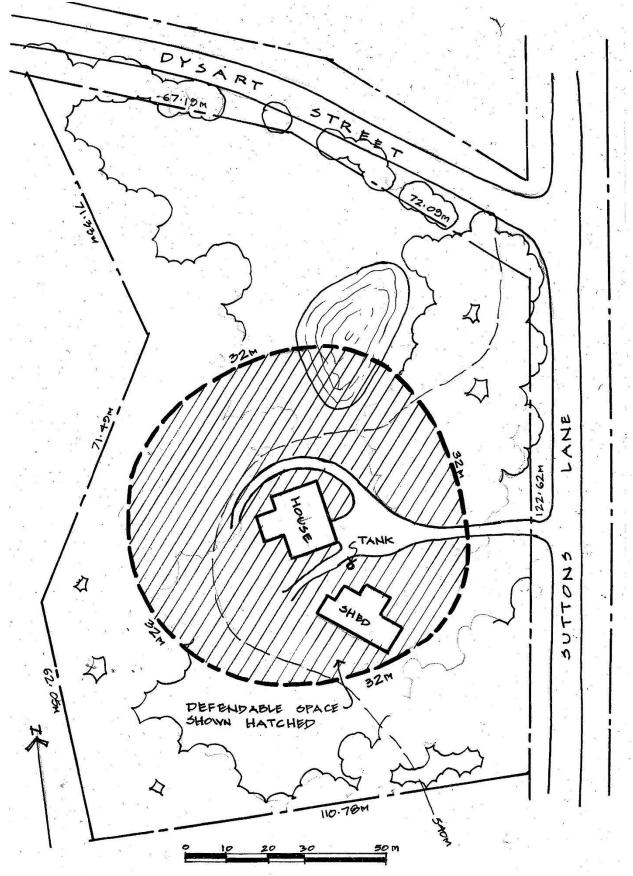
DEFENDABLE SPACE, ACCESS AND WATER SUPPLY PLAN
